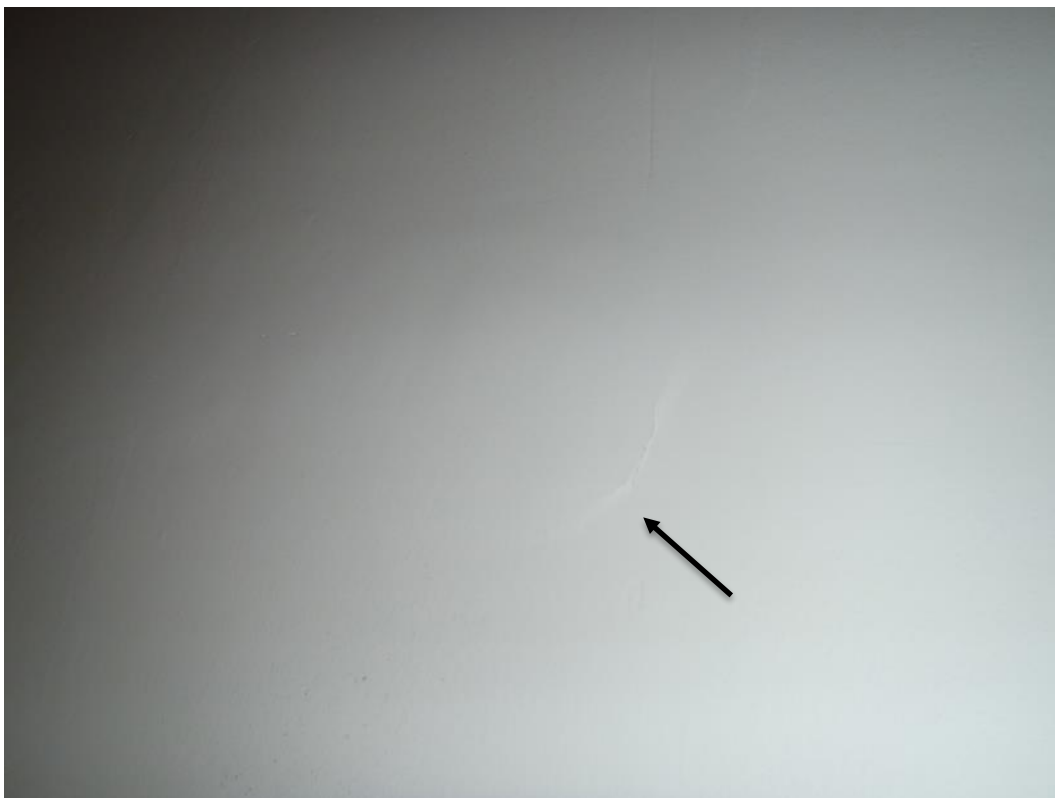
shows separation cracking between the wall to wall junction in the north-eastern corner above the door & separation cracking to the mitre joint of the cove profiled plaster cornice in Bedroom 1.
